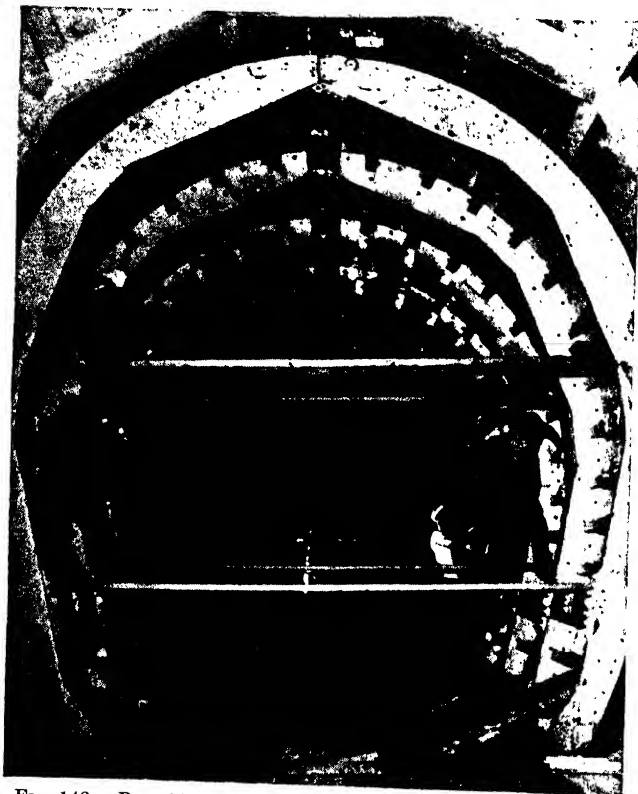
Portable steel form for placing concrete tunnel lining.
